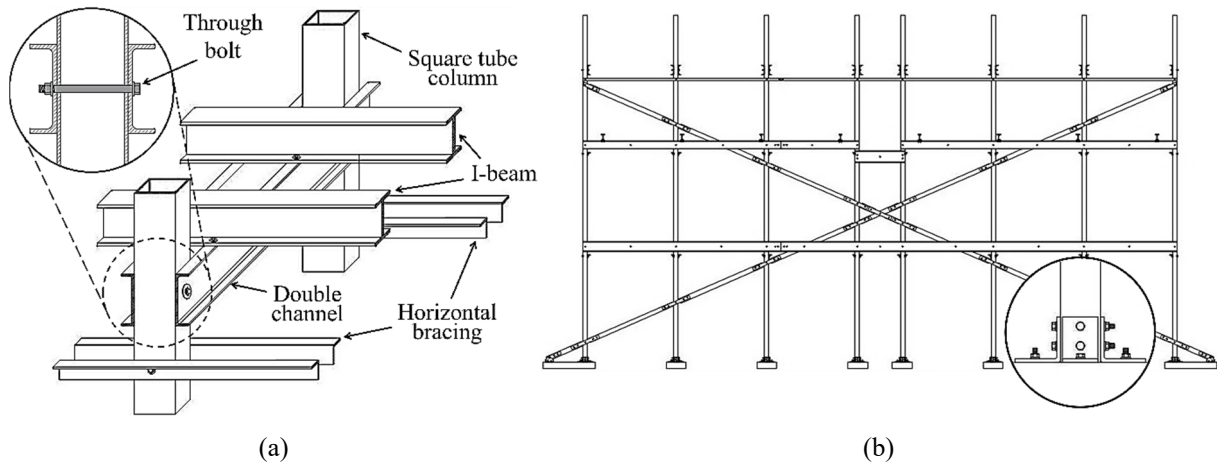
(a) Beams, columns and horizontal bracing; (b) vertical bracing and column base support.
